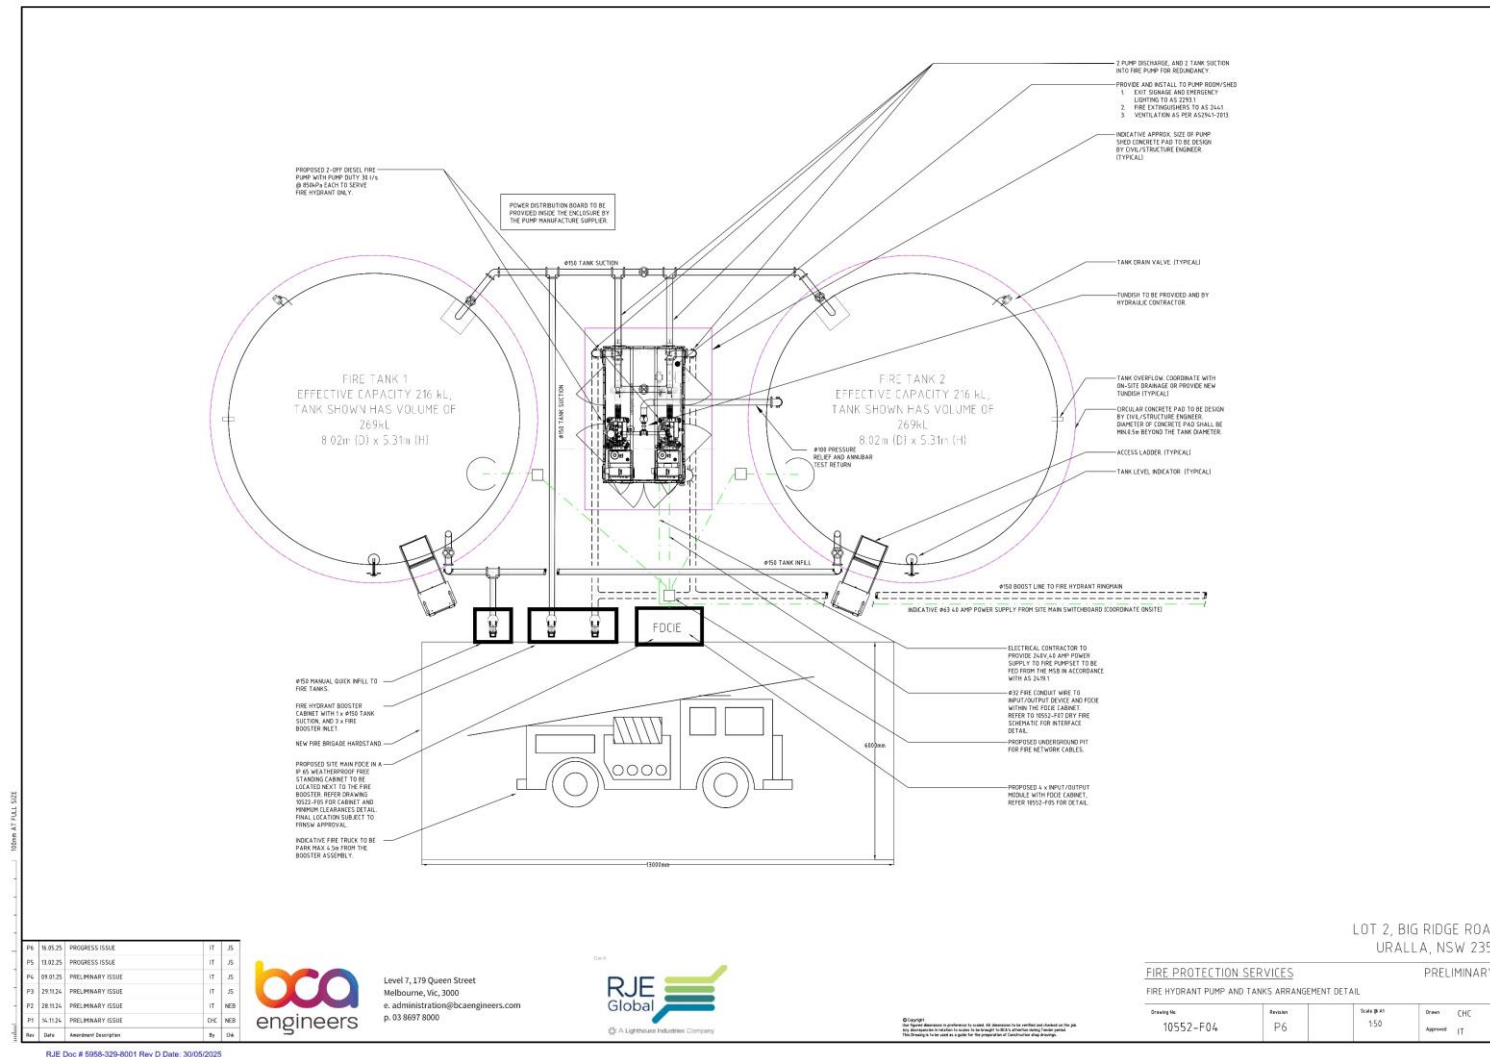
Fire hydrant tanks, booster assembly and hardstand
